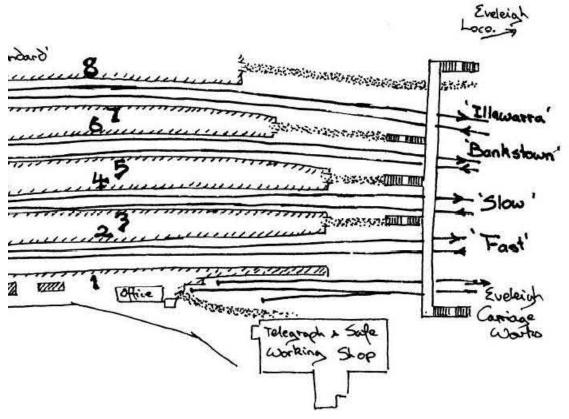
Station layout 1912-15 shows a building like Platform 1 Office named 'Office' and connection to Telegraph building (Telecommunications) and Eveleigh Railway Workshops (Paul Davies Pty Ltd, 2007)
